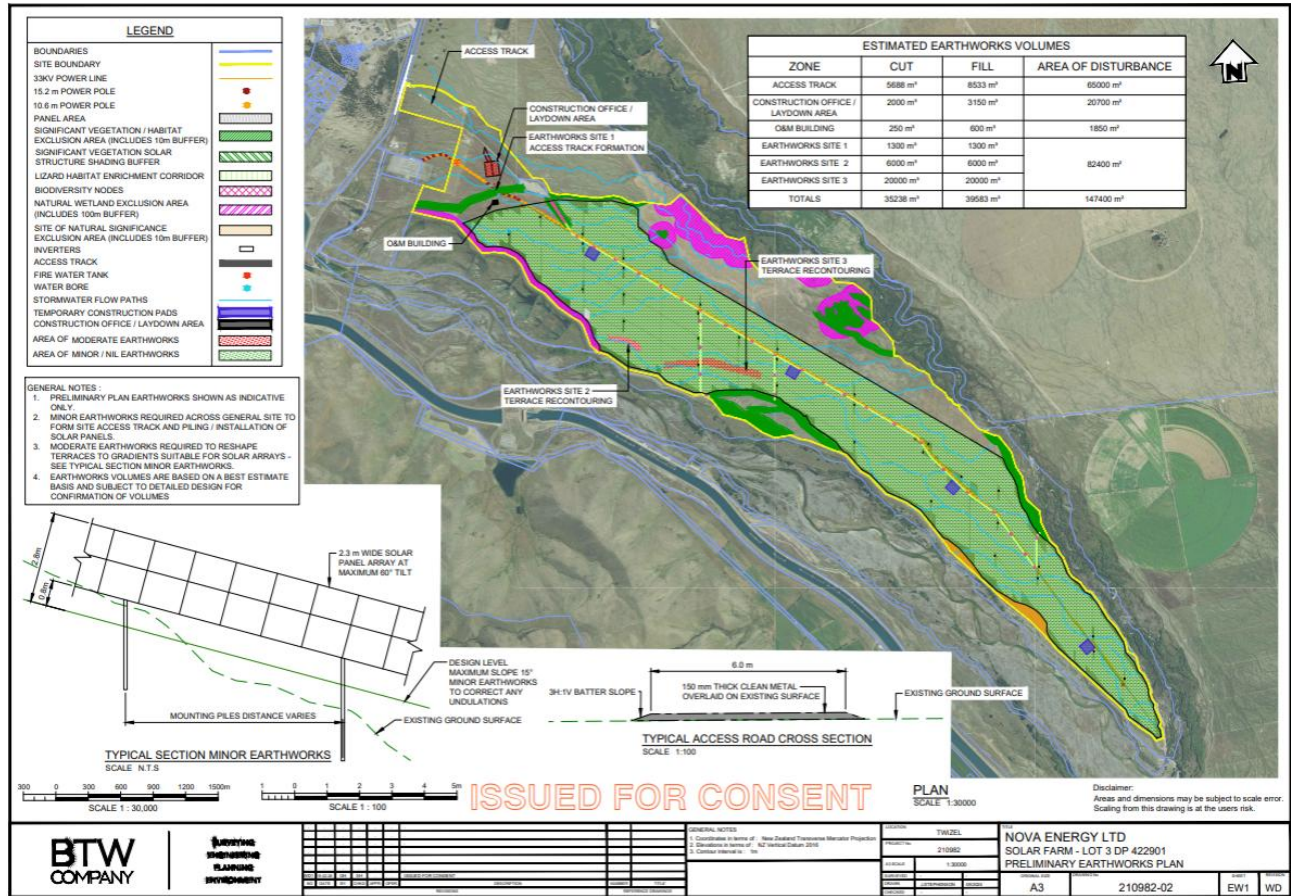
Earthworks Plan (source: BTW, 2026)
